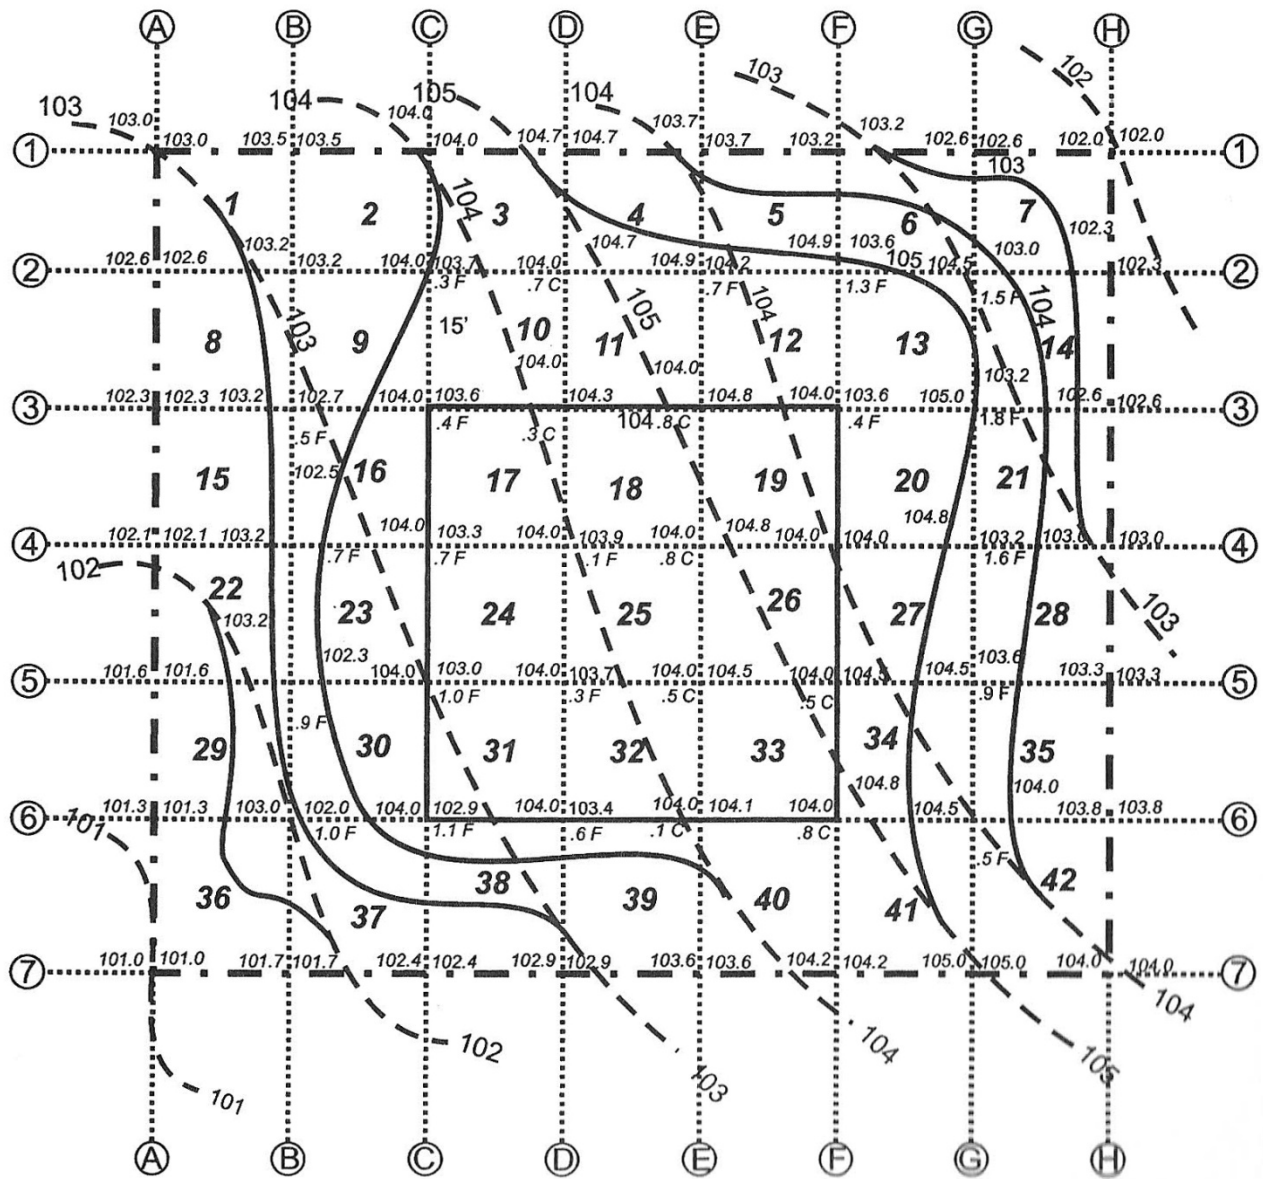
Site Plan Divided in 50 ' Square Grid with Elevations
